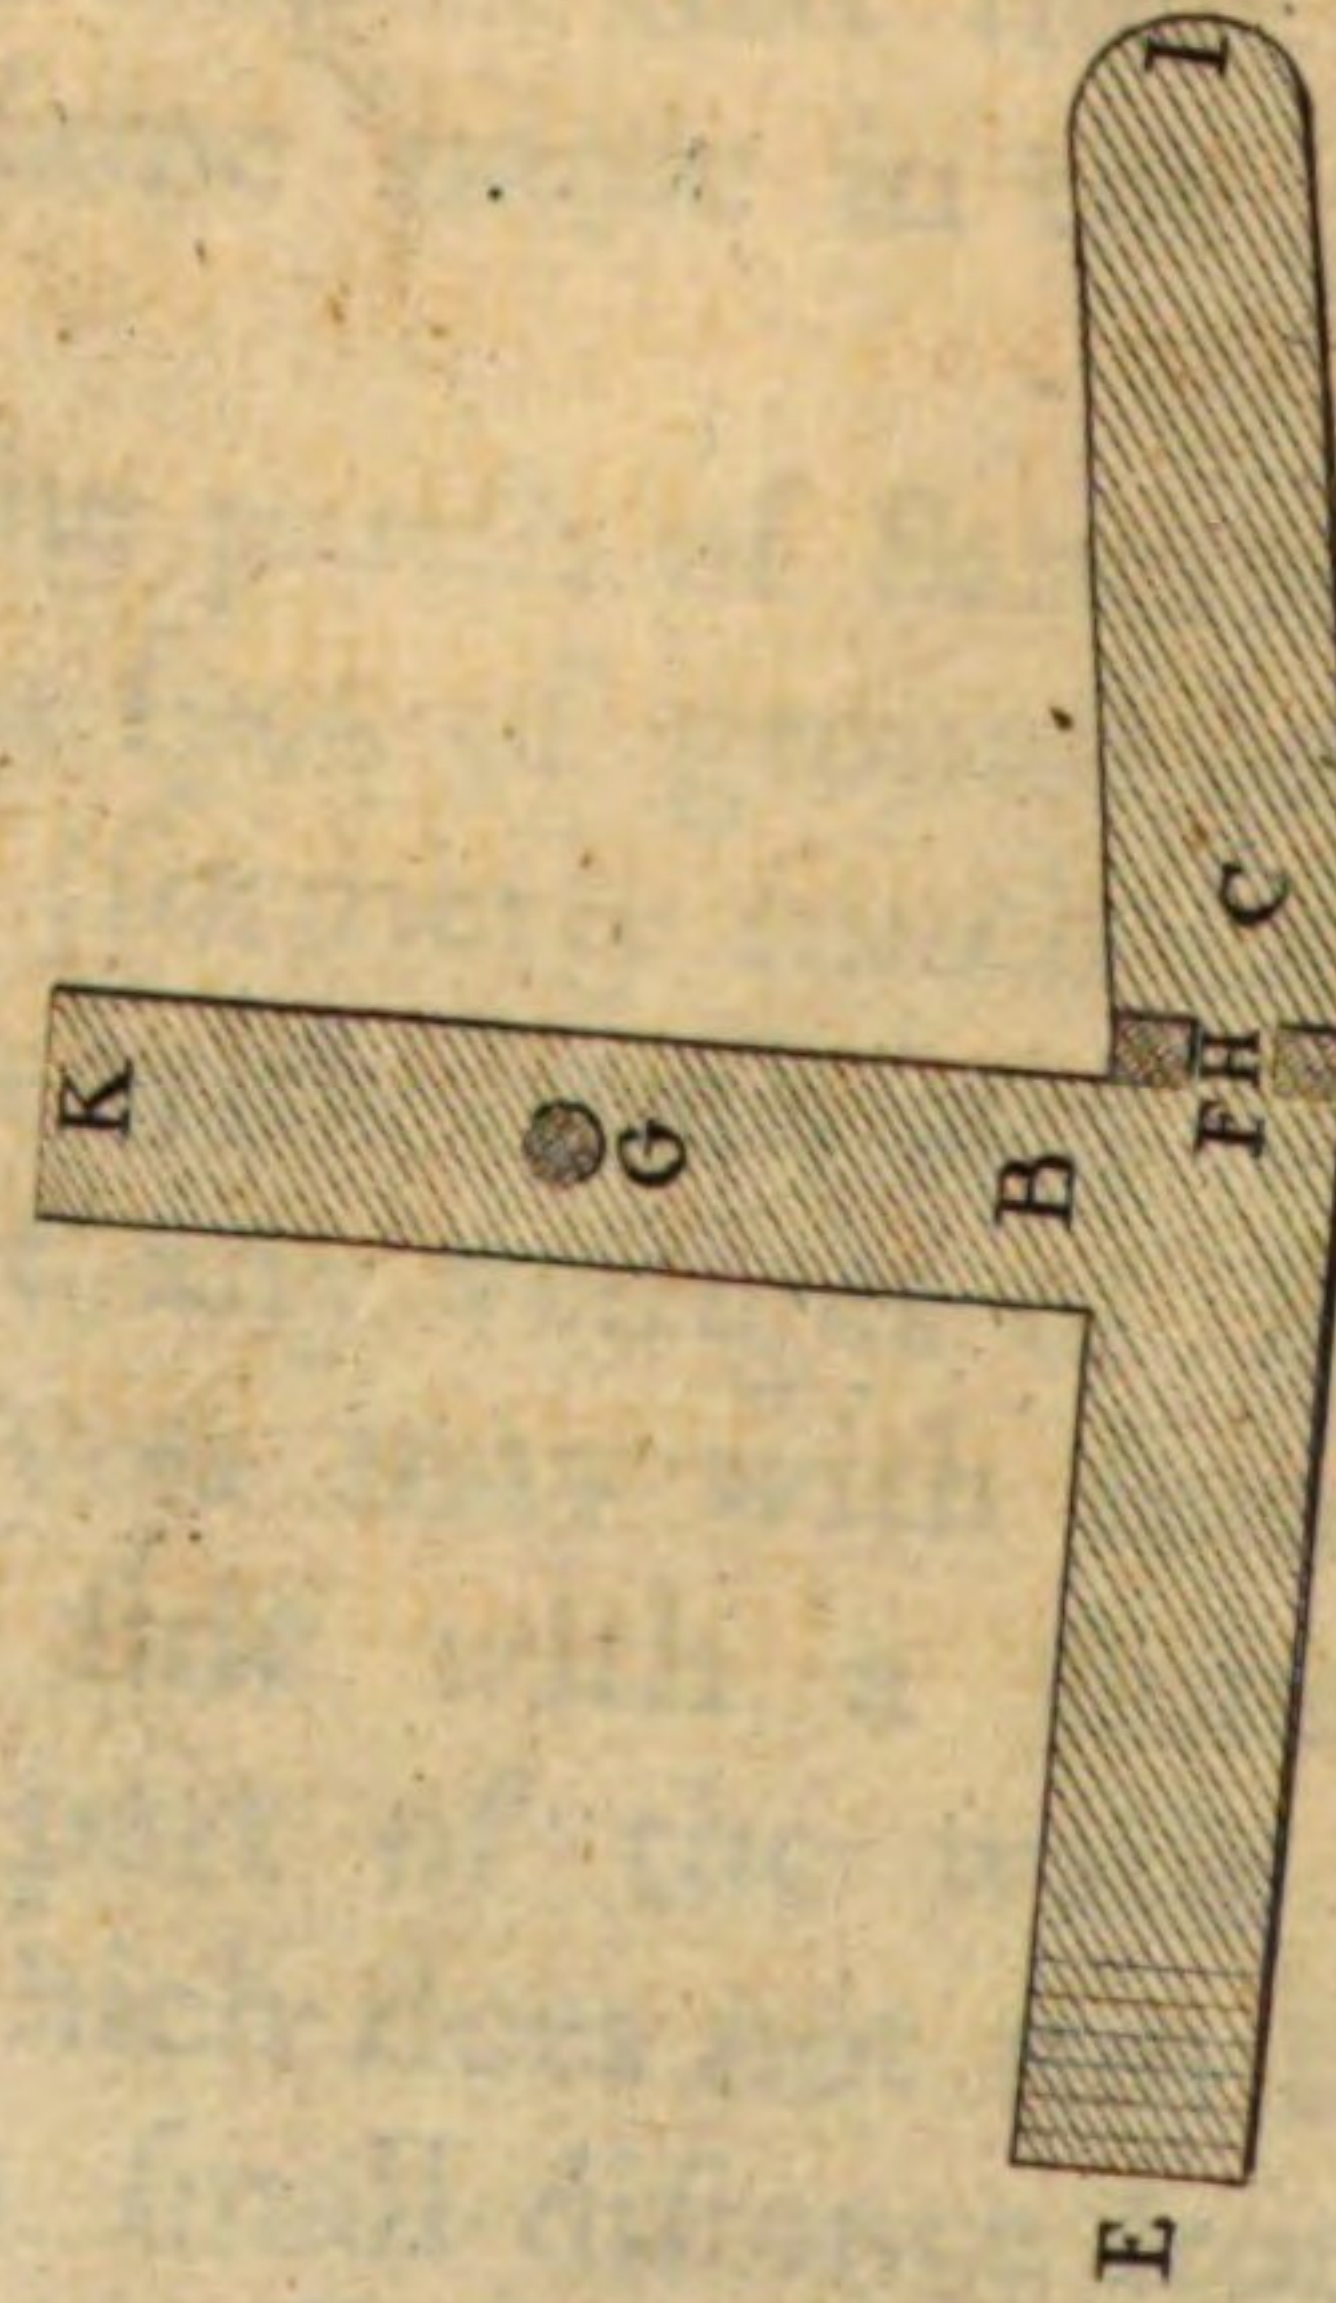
Fig. III. Plan. of Pendeen Vault, or Vault. p. 293.
